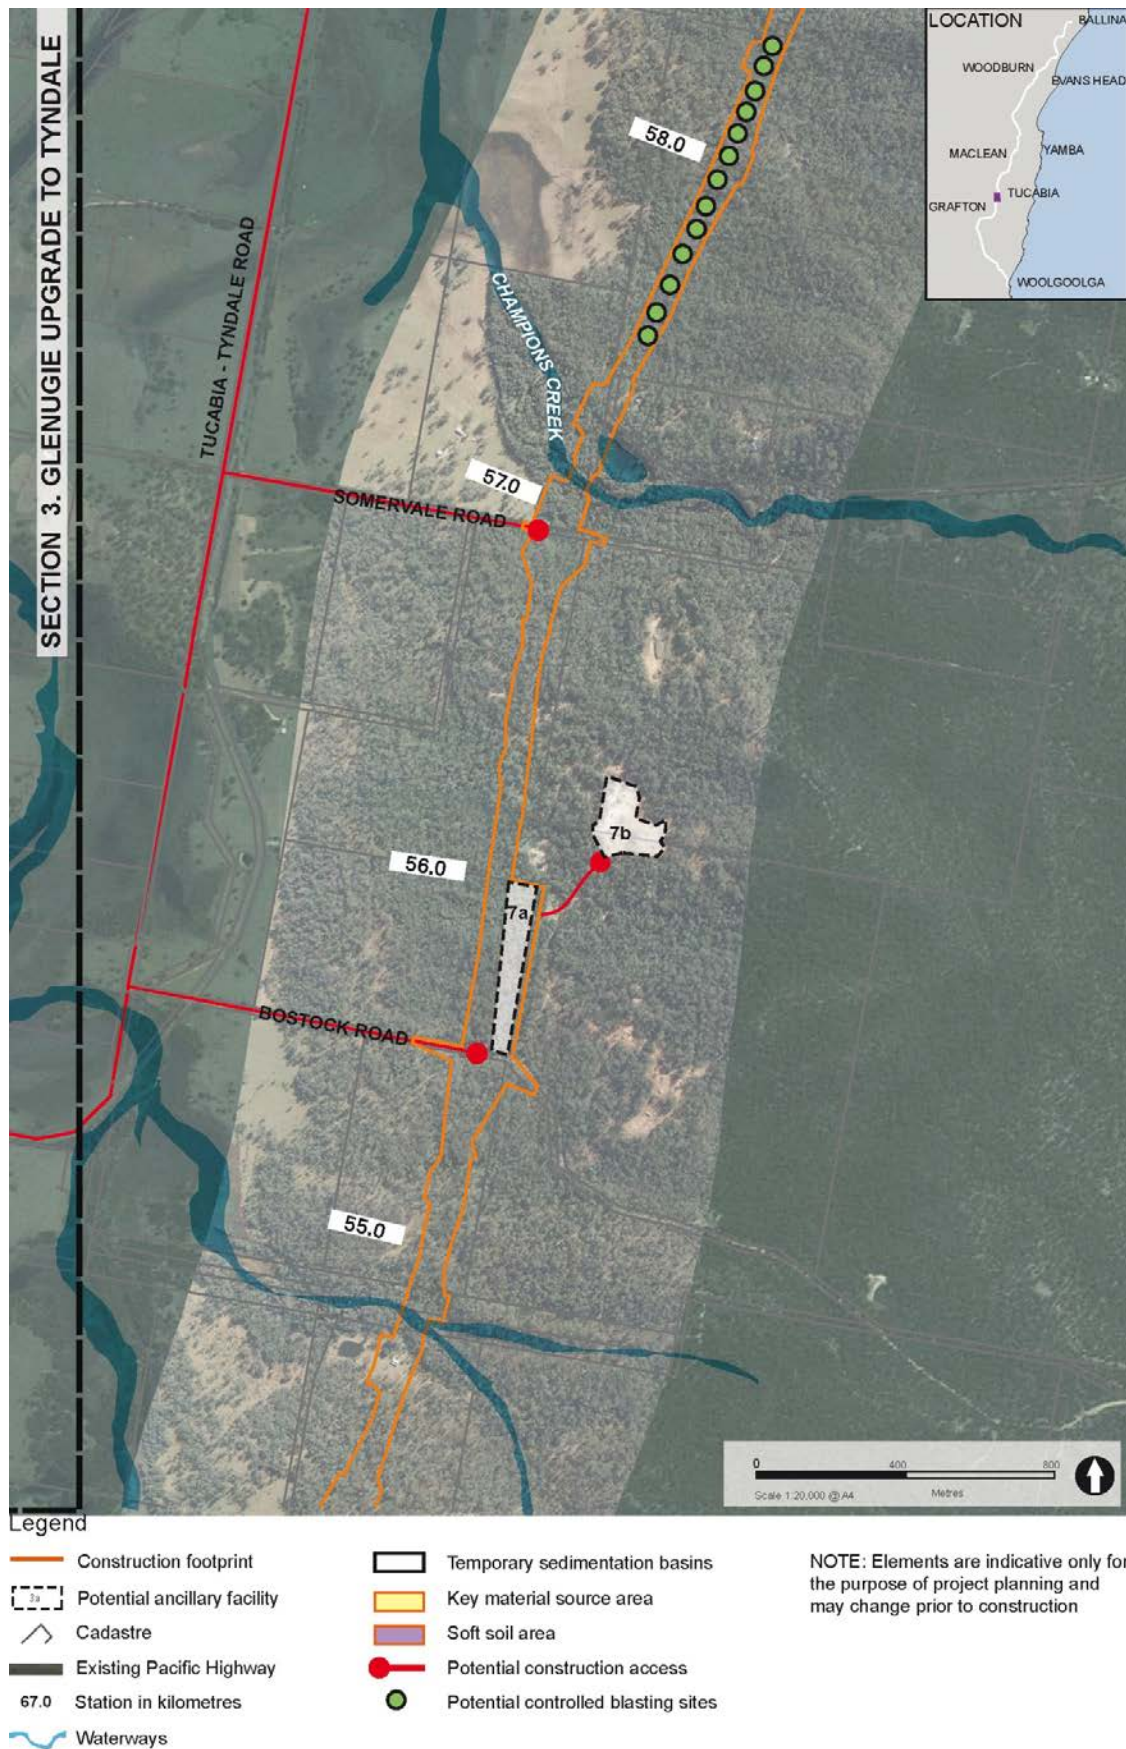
Extent of construction and construction features Section 3 (Station 54.3 to 58.4)
